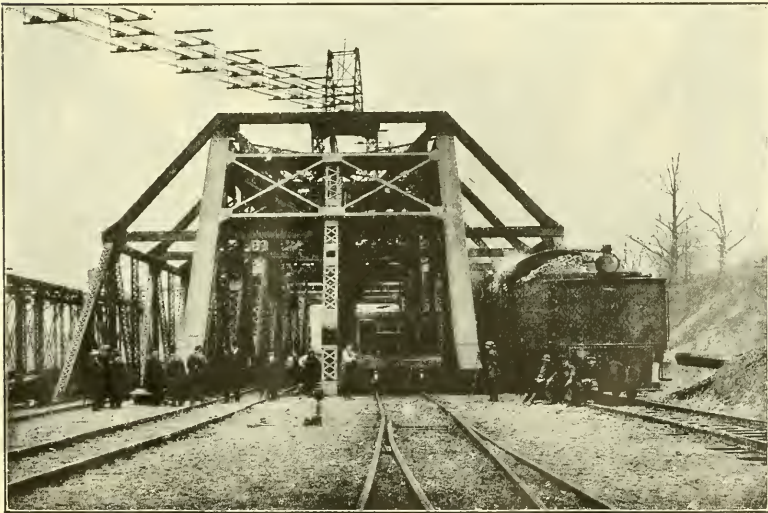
END VIEW OF CONNEAUT BRIDGE DURING LOADING TEST.
